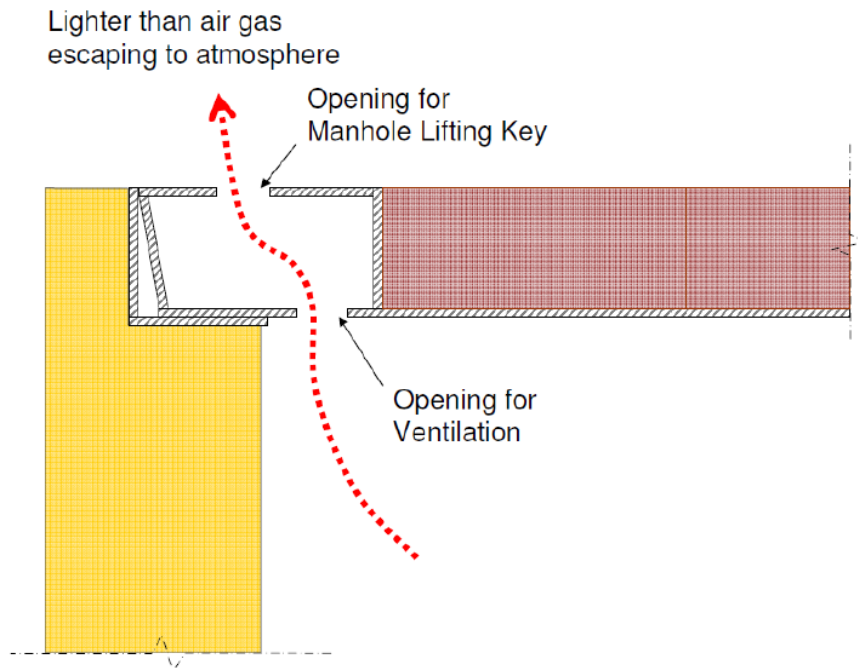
Schematic Layout of Vent Hole in the New Design for Concrete Infill Cover or Recessed Manhole Cover
